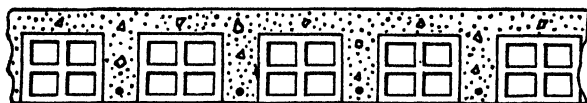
Details of One-Way Hollow Tile Floor Slab.* (See p. 628.)
